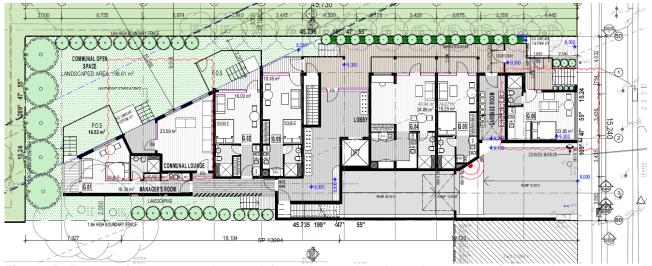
Extract of the proposed ground floor plan, noting the reduced size of the garbage store and relocation of the manager's room.
